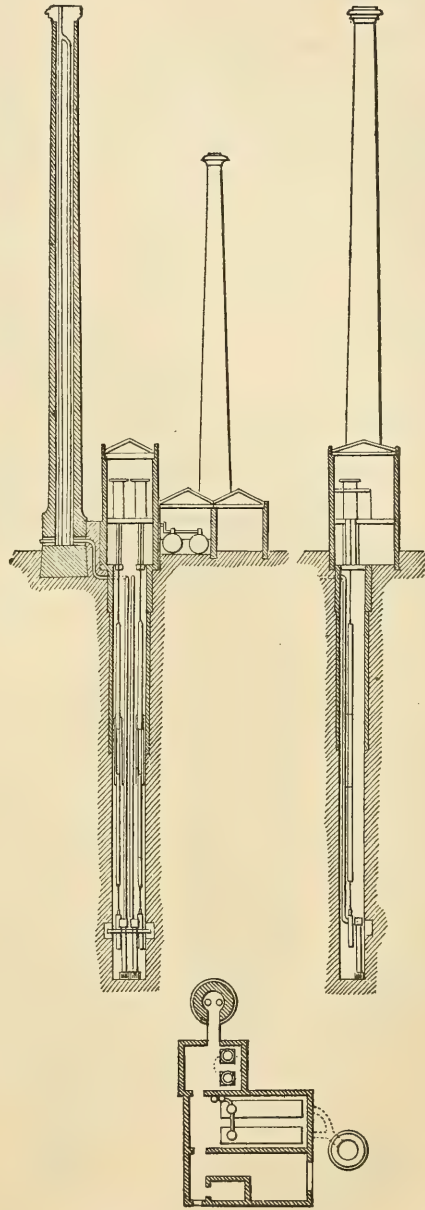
Tettenhall Pumping Engines. Elevations and Plan.
